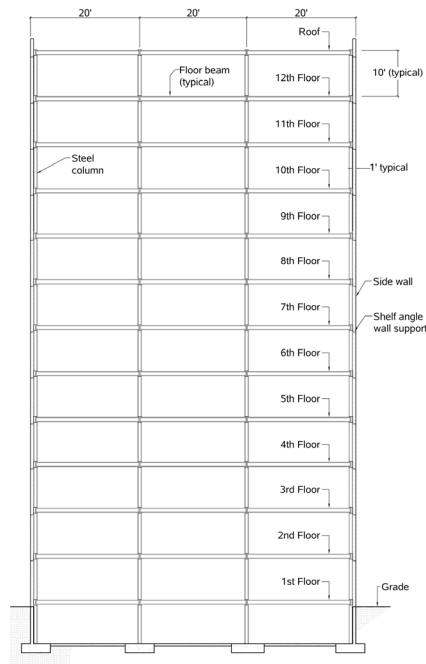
Transverse section of a skeleton building. Note that floors and interior partitions are not shown for clarity, and that the walls are 12 inches thick top to bottom.
